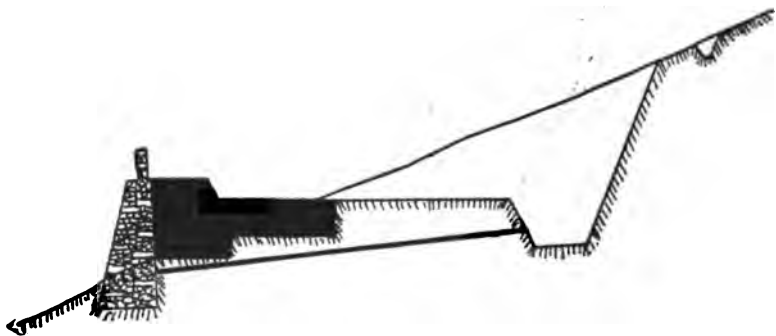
SHOWING METHOD OF CONSTRUCTION ON HILLSIDES.
